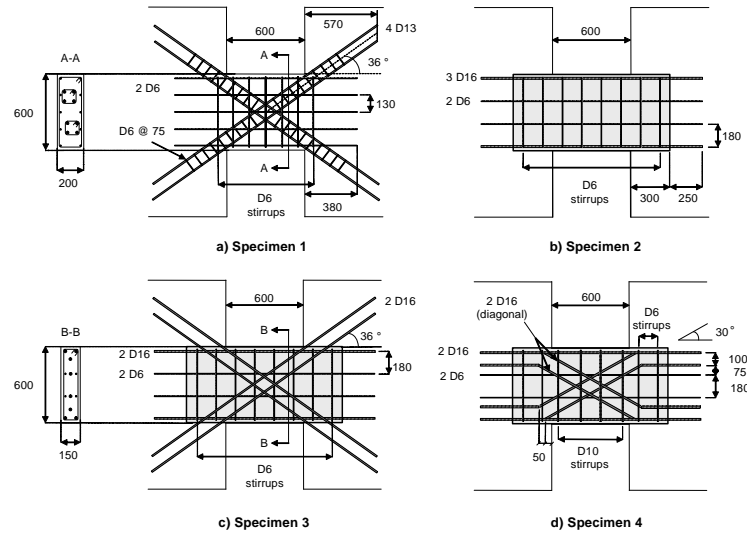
Reinforcement of specimens with  $\ell_n/h = 1.0$  [3]
